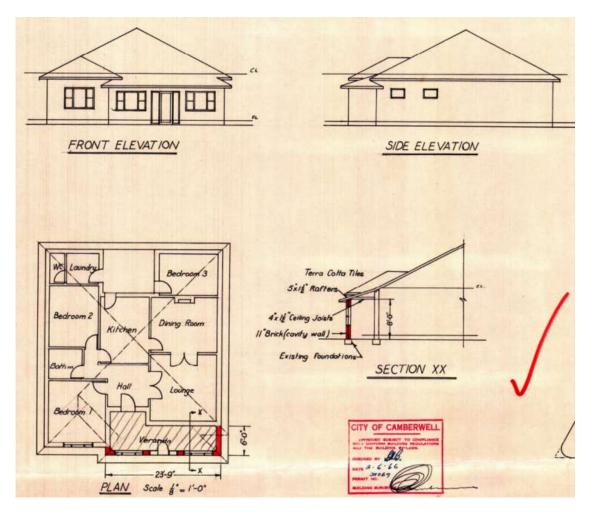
1966 plans showing the enclosure of the front verandah. New construction is shown on the plan and section in red. Note that, apart from removal of the original porch supports, no demolition took place.
